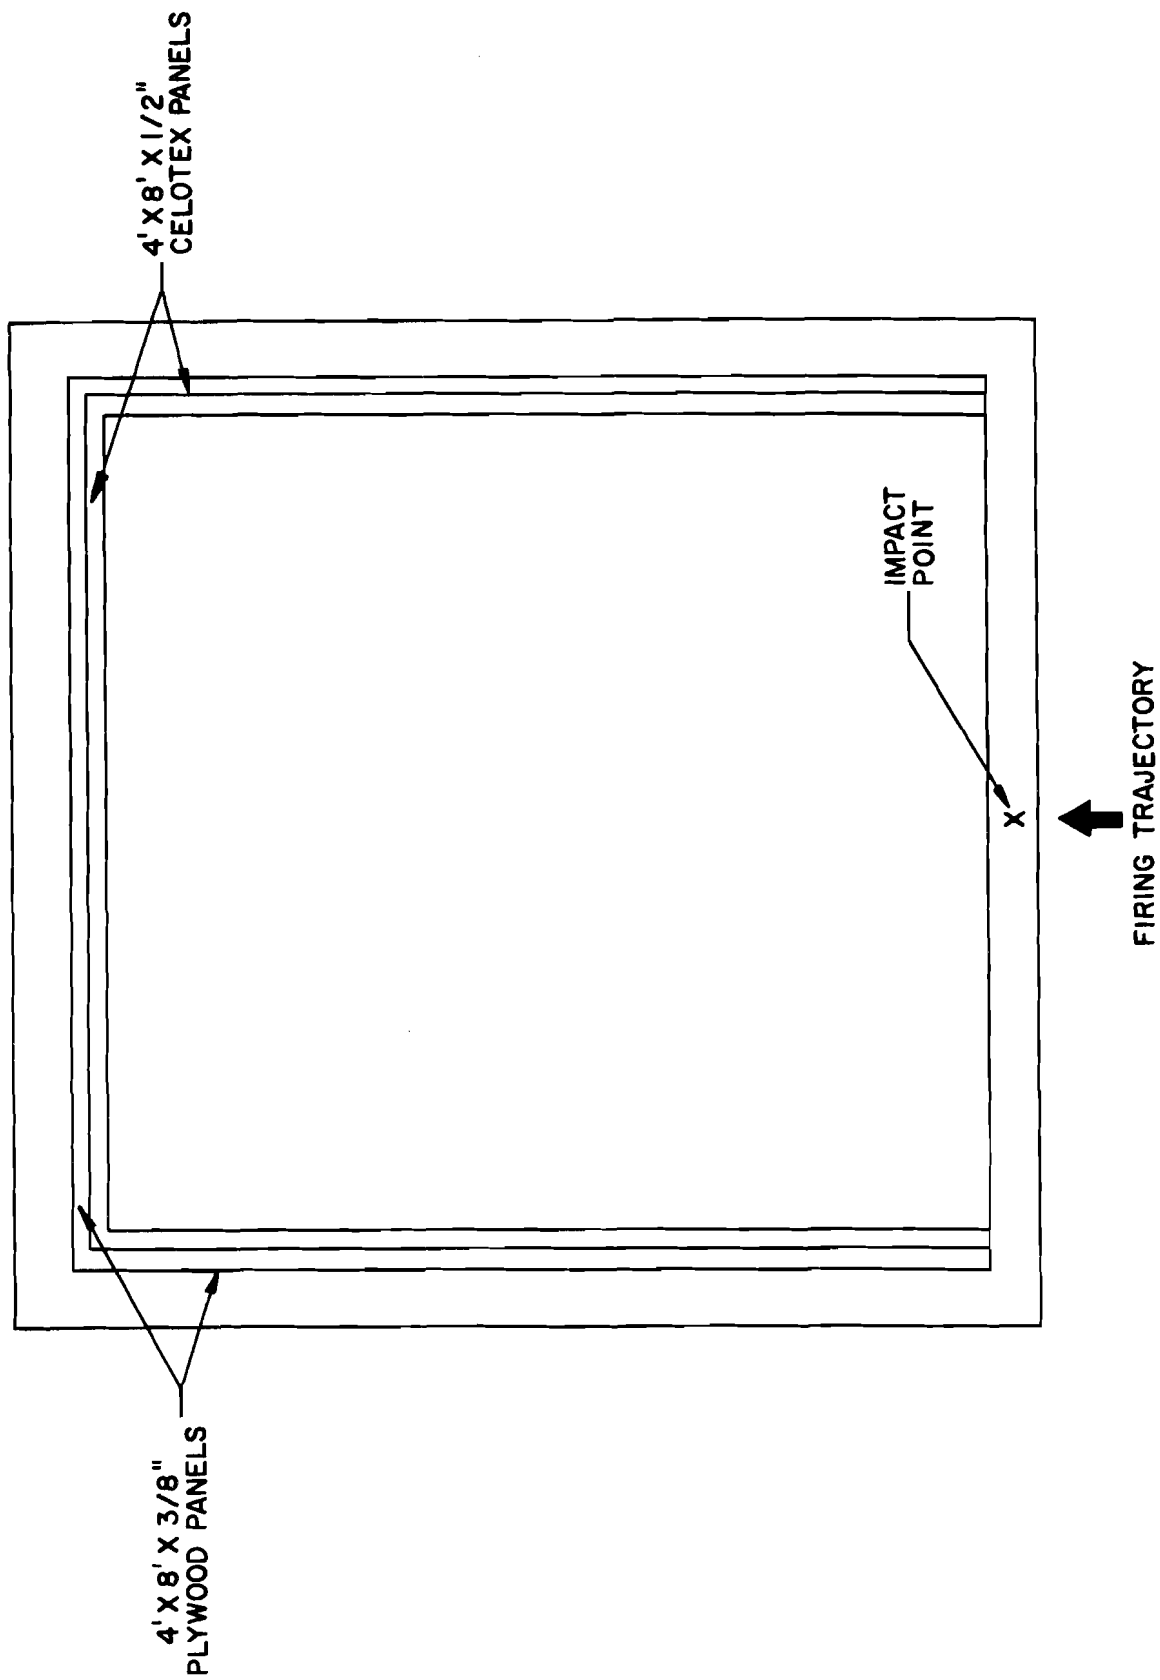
Typical instrumented room for in-wall/on-wall bursts.
